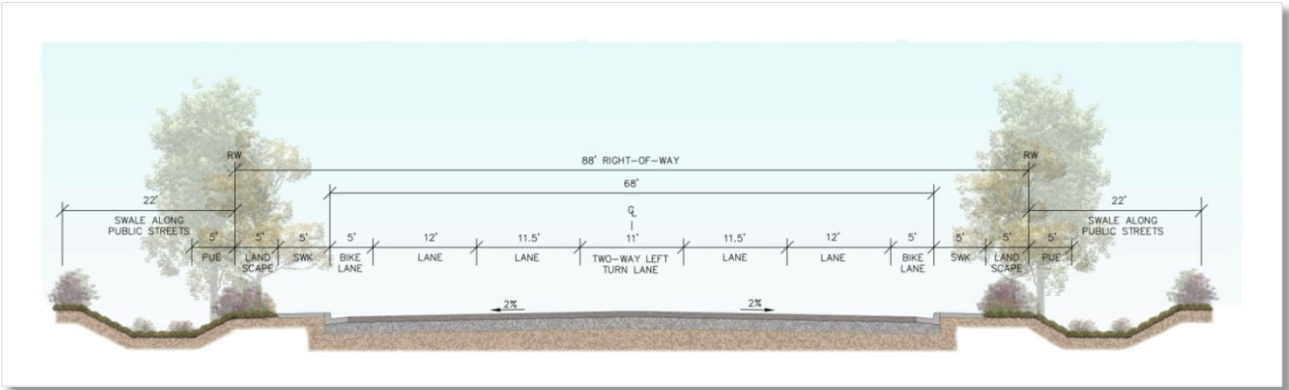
Proposed Harris Road, Southwest of Harris Place
